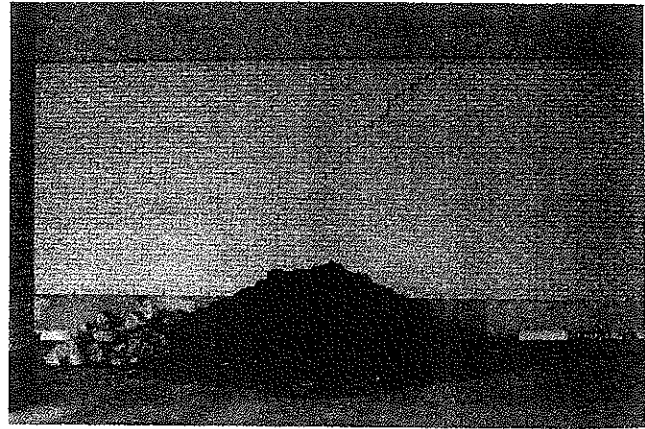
Cracked brick veneer on a pier and beam foundation.
